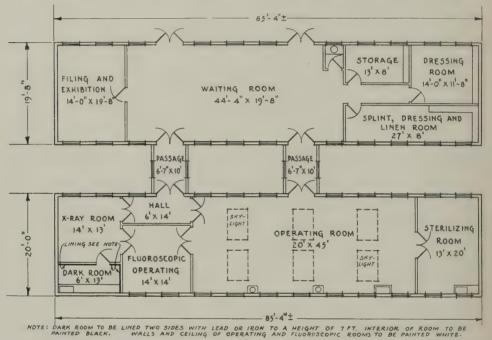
Operating and X-ray building, hospital unit, type A. This plan was adopted December 15, 1917, and was to be used only when demountable buildings were to be used. The permanent type is shown in Figure 38
